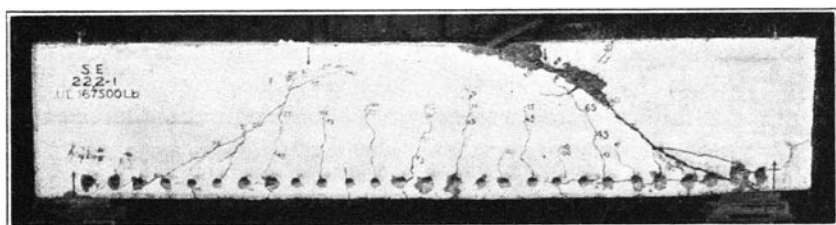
VIEW OF BEAM 222.1 AFTER FAILURE, SERIES OF 1922
